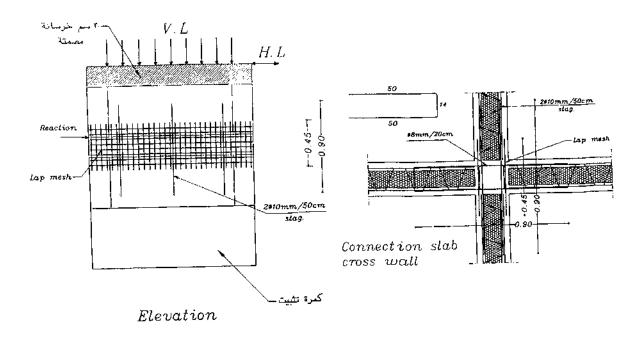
Details of Additional reinforcement for Specimen (W4)
